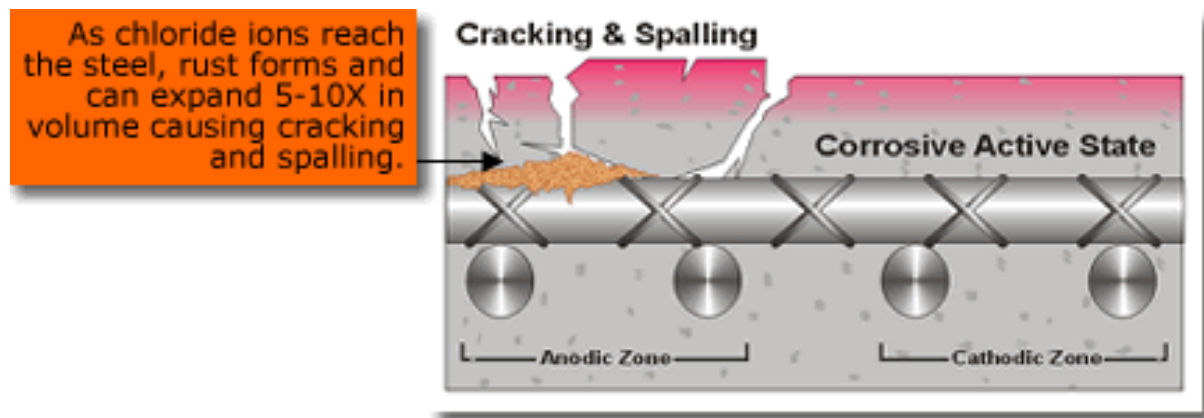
Cracking and spalling of concrete due to penetration of chloride ions
